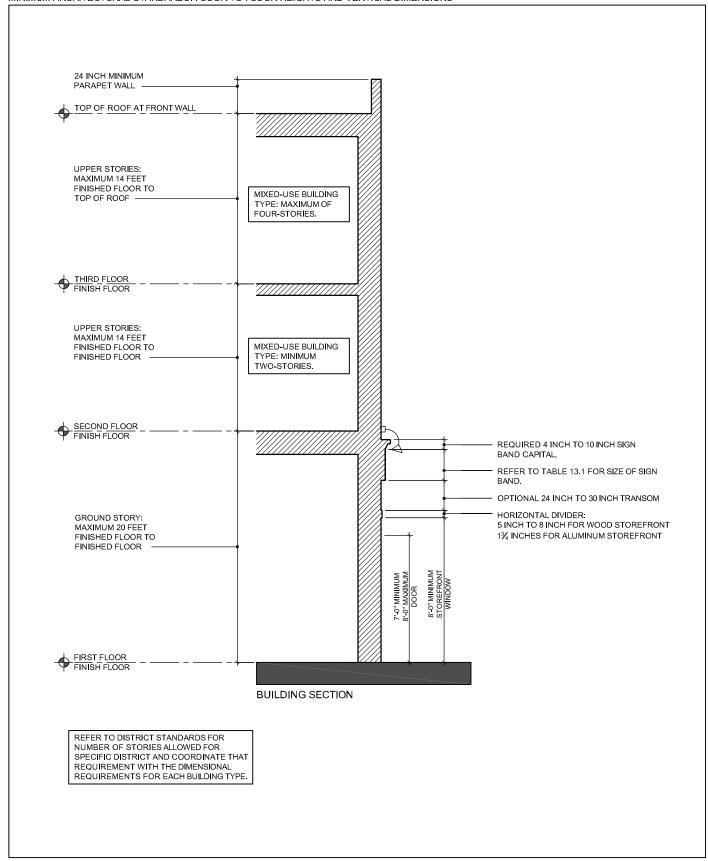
MIXED USE BUILDING TYPE MASSING
